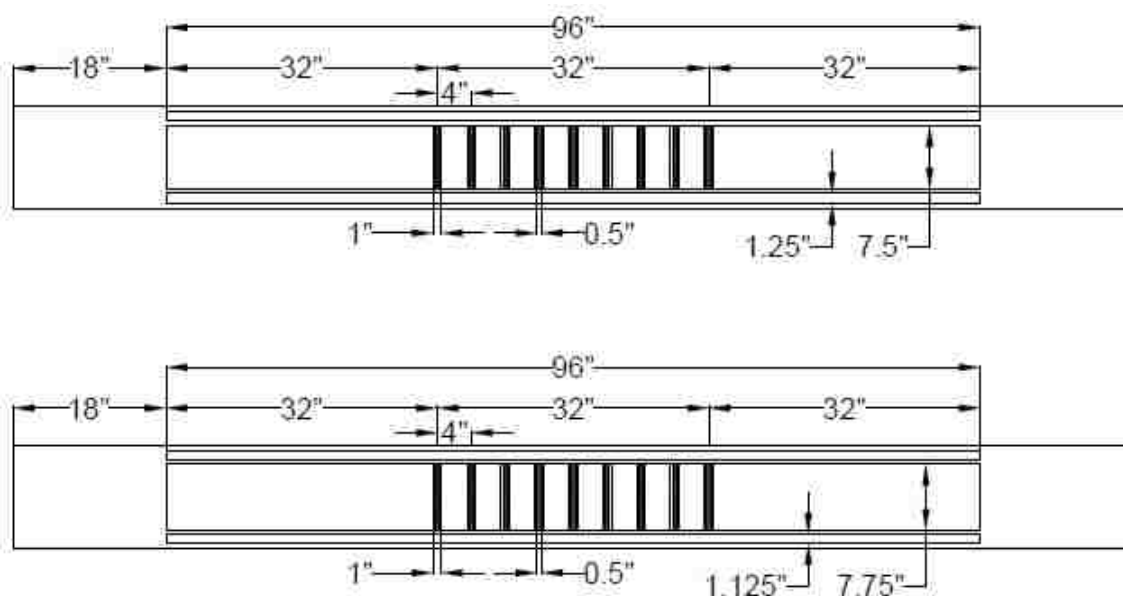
FRP Configuration: Beams 4, 5 and Beams 6, 7
